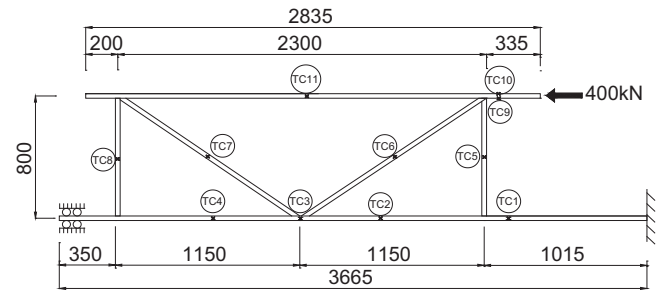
Test specimen SP1 of Liu et al. [8] (dimensions in mm).
